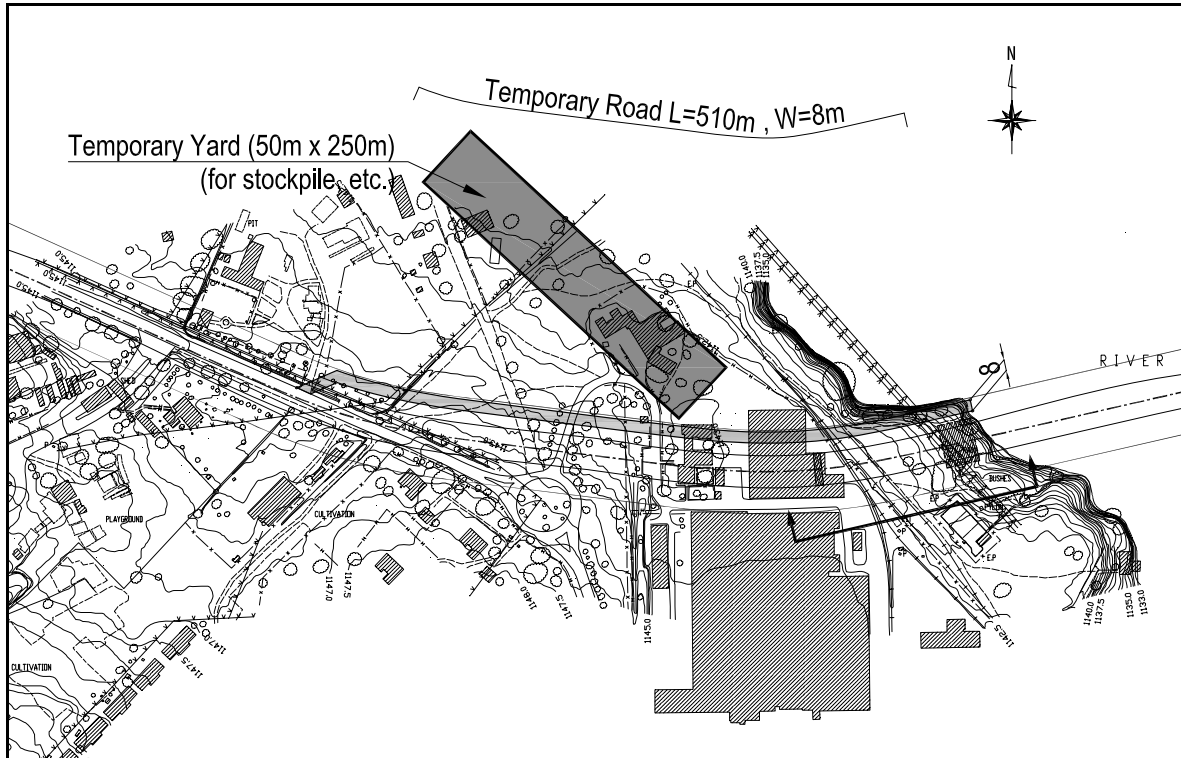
Location of Temporary Road and Yard at the Njeru side
